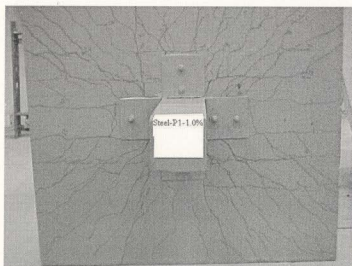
Specimen Steel-P1-1.0% after final testing
